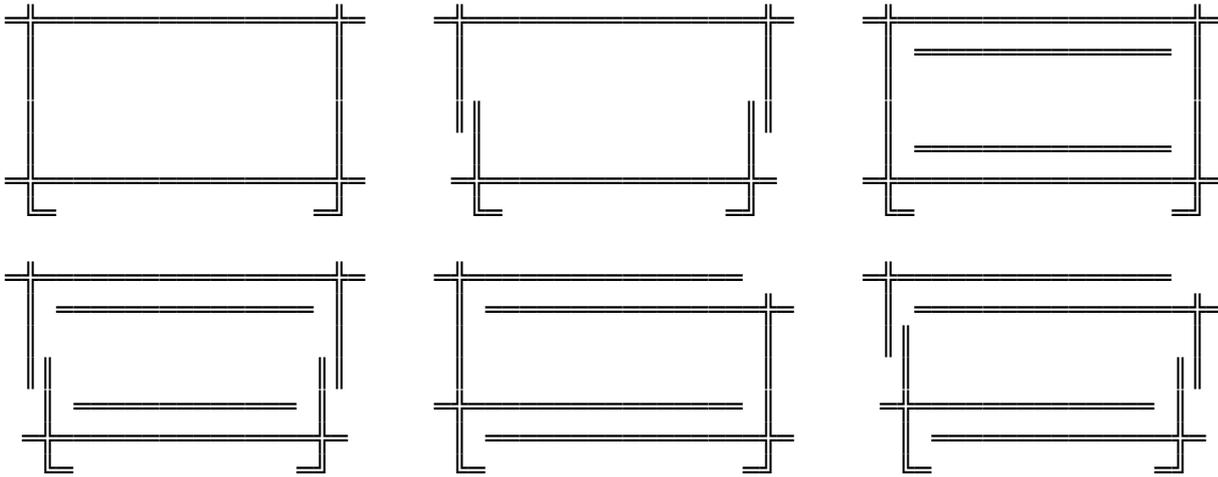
INTERNAL FACE REINFORCEMENT
